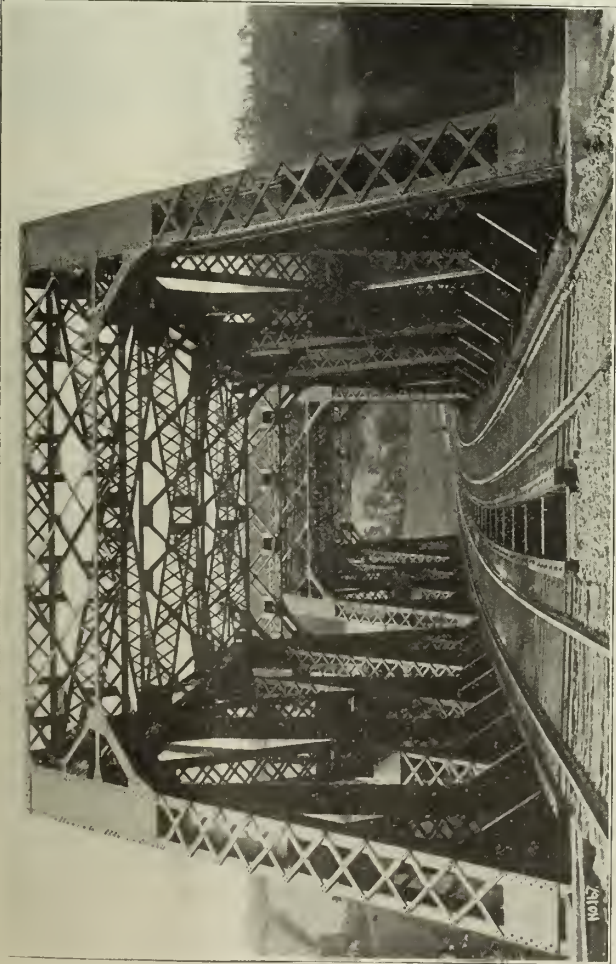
Bridge No. 1 at George's Creek Junction, Looking West.
